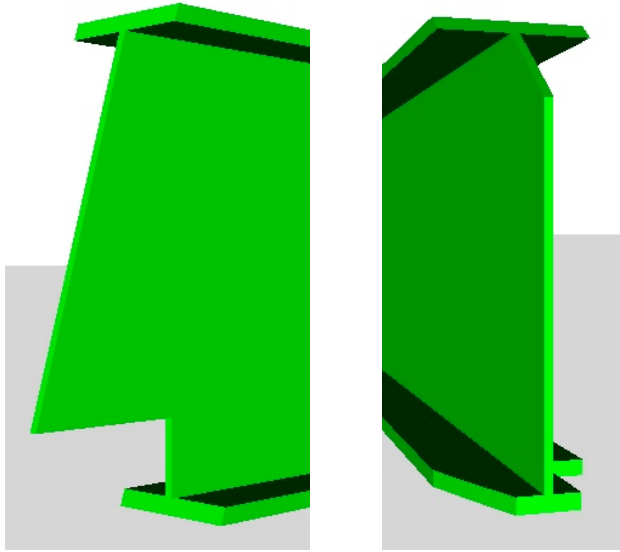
Typical cutouts – miter cut, notch (left) – chamfer, flange chamfer, flange notch (right)
